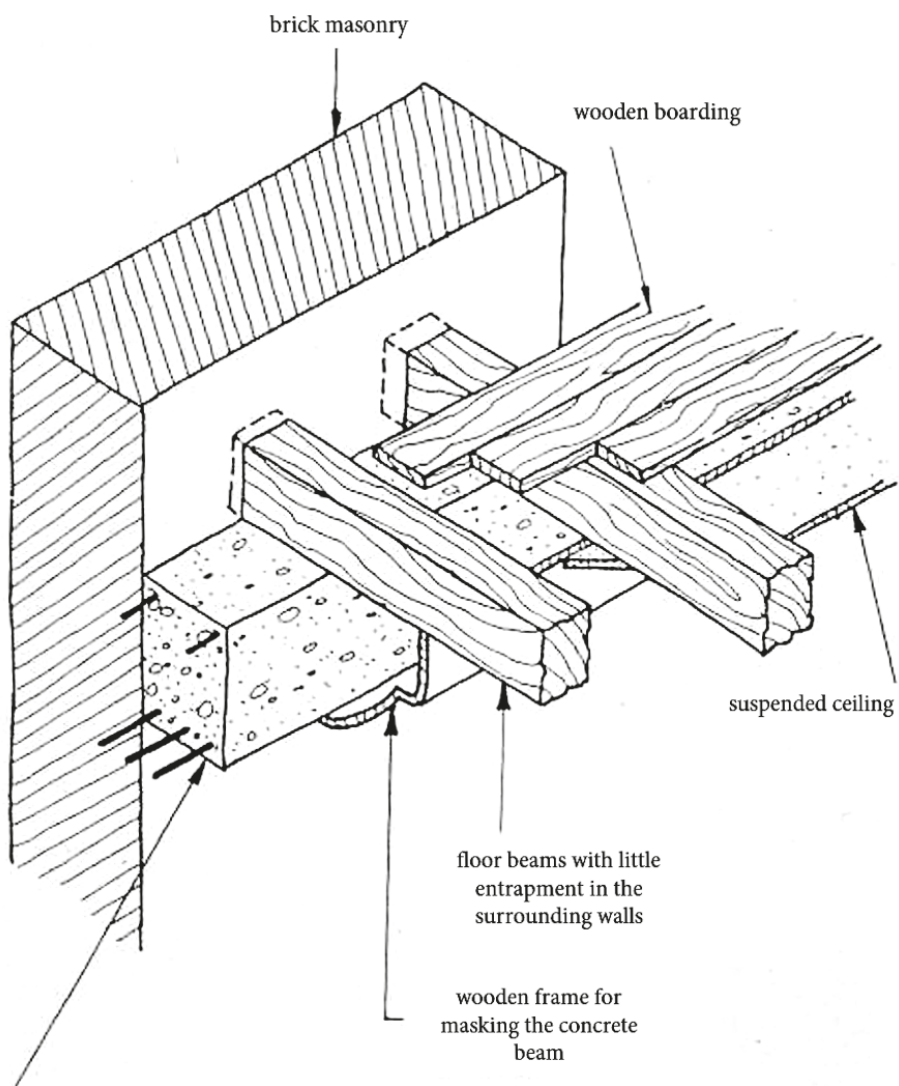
Reinforced concrete beam for the support of wooden floor beams. From A. Bellini, *Tecniche della conservazione*, Ex fabrica, FrancoAngeli, Milano 1990, p. 280.
